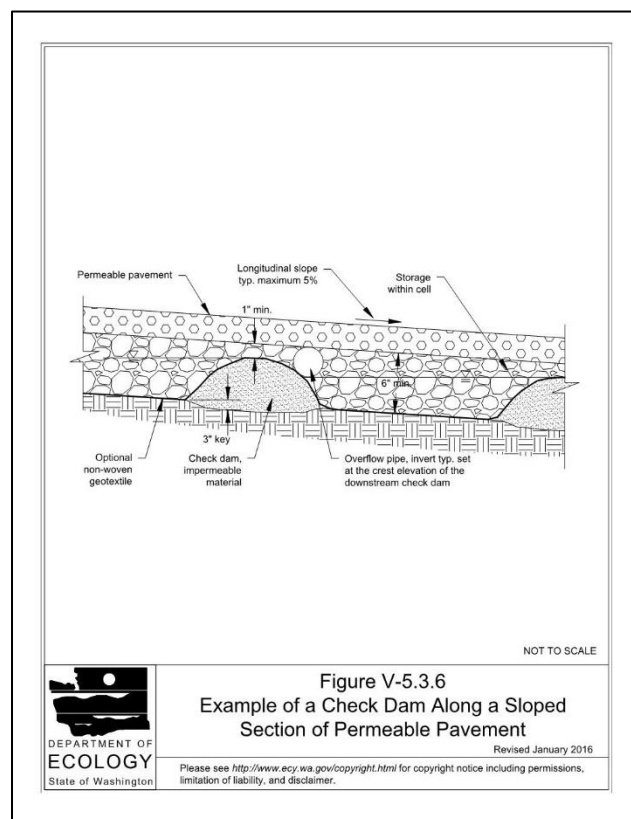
Example of a Check Dam Along a Sloped Section of Permeable Pavement
